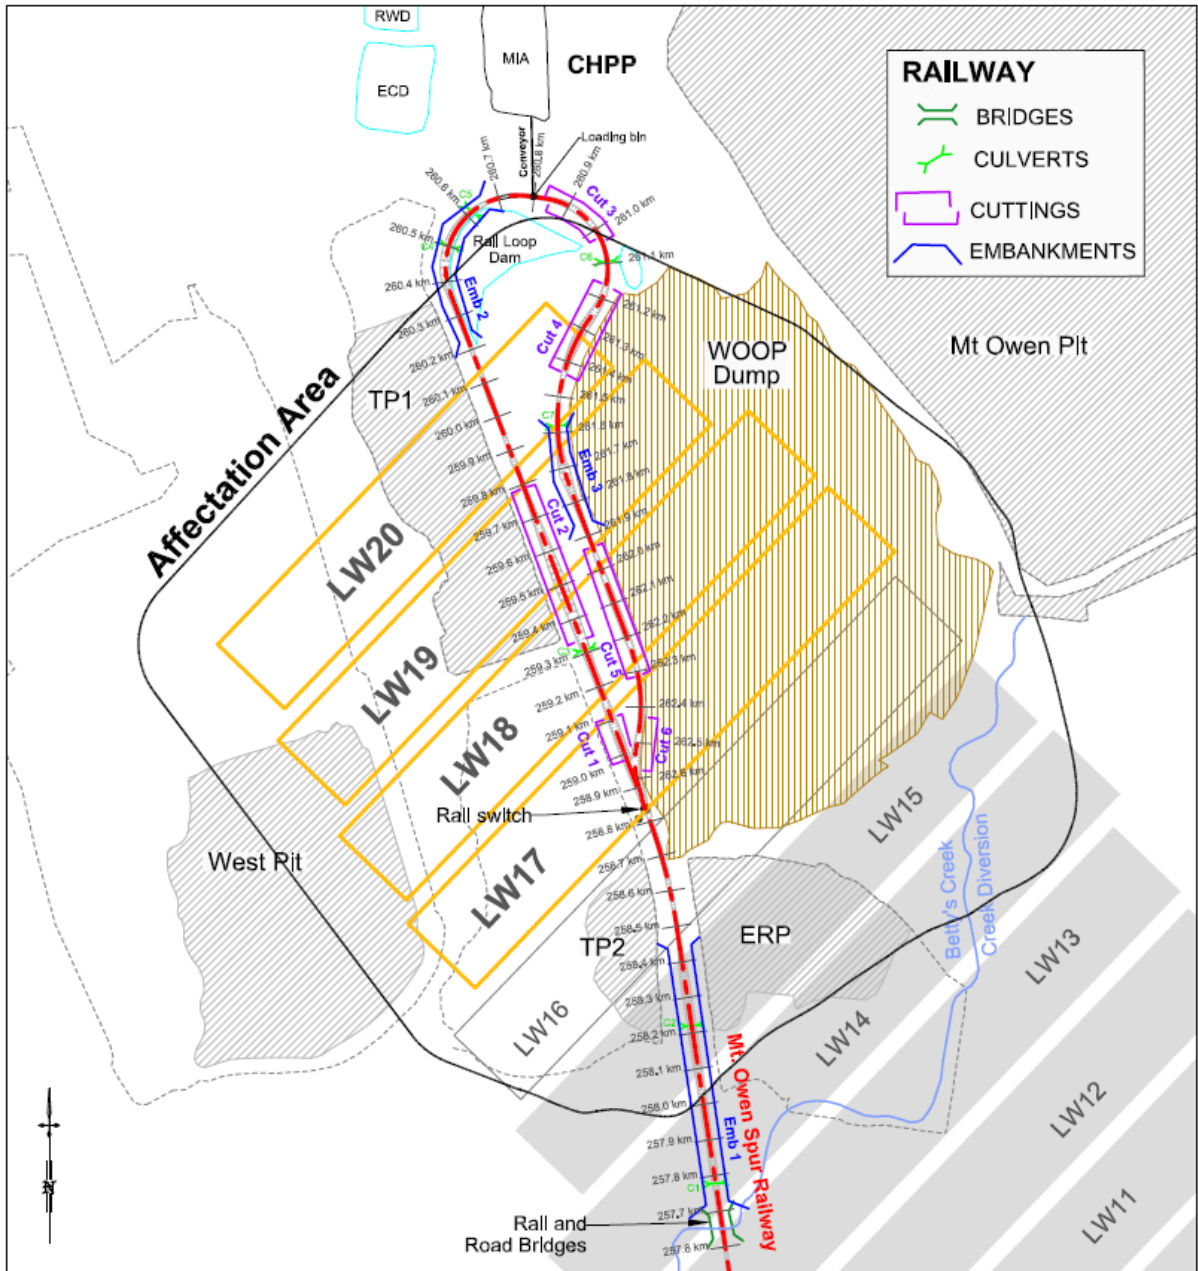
Mount Owen Railway and the Longwalls at Integra Underground
